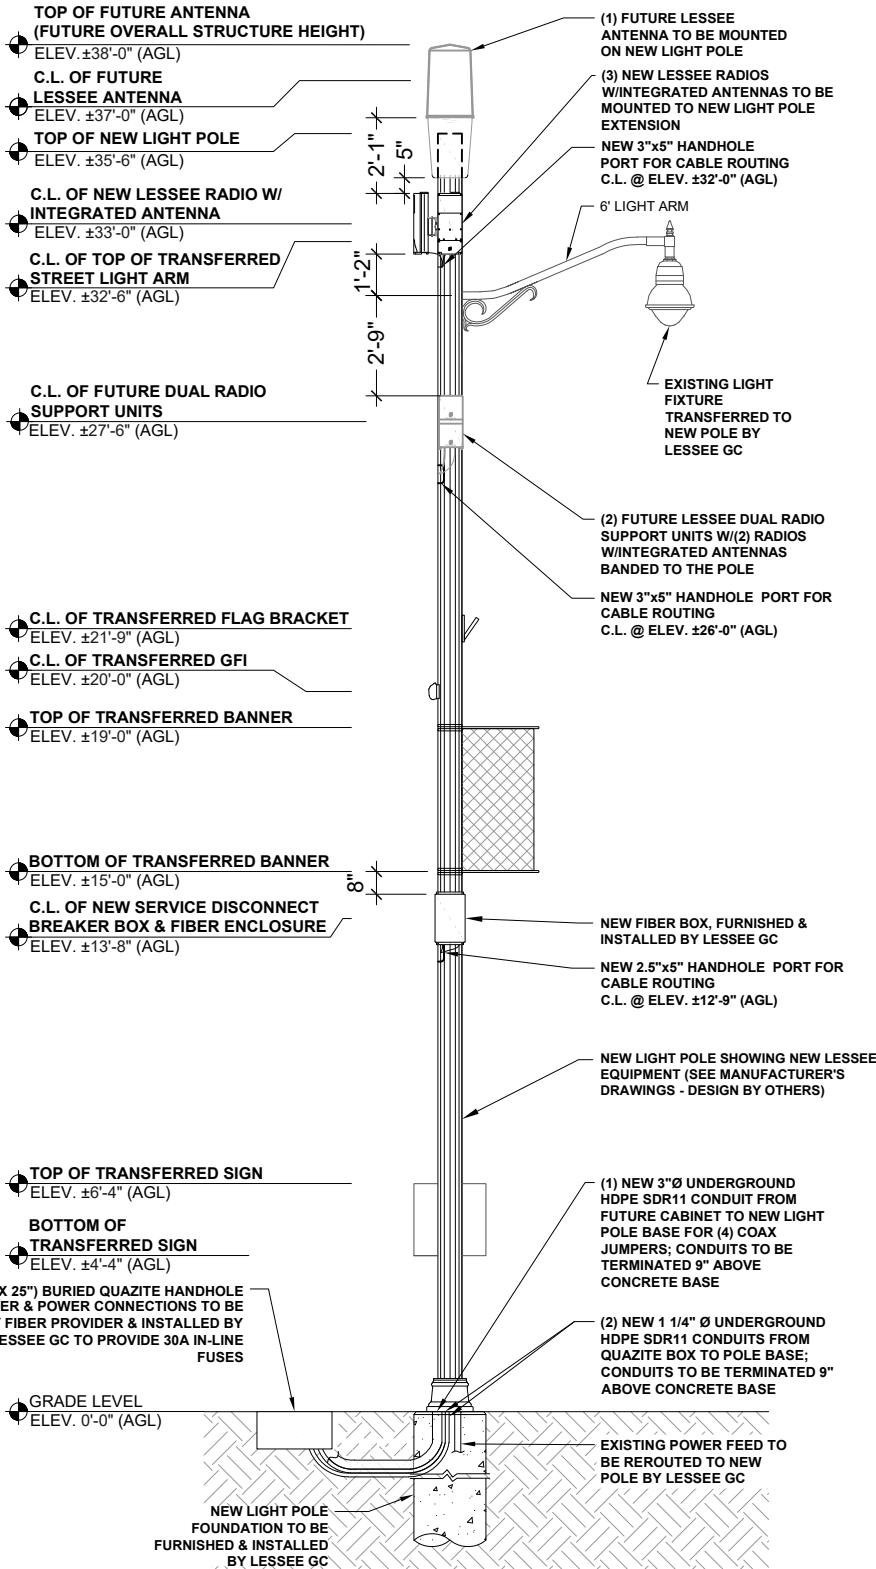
EXHIBIT B - Site Plan of Proposed Verizon Electrical Line Installation
